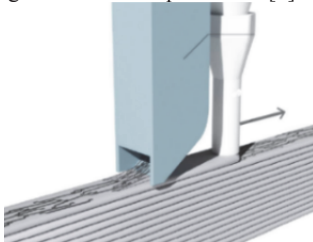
Reinforcement of the structure with fiberglass with separate laying of fiber and concrete
